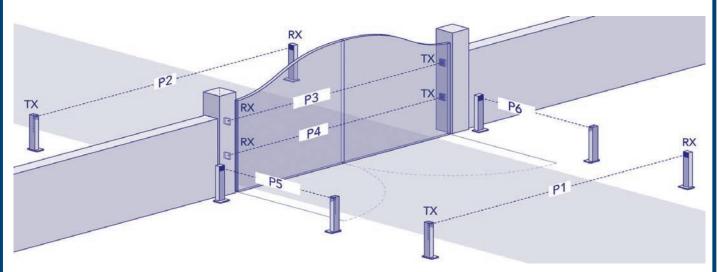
POSSIBLE ENTRAPMENT ZONES AND PHOTO EYE LOCATIONS
